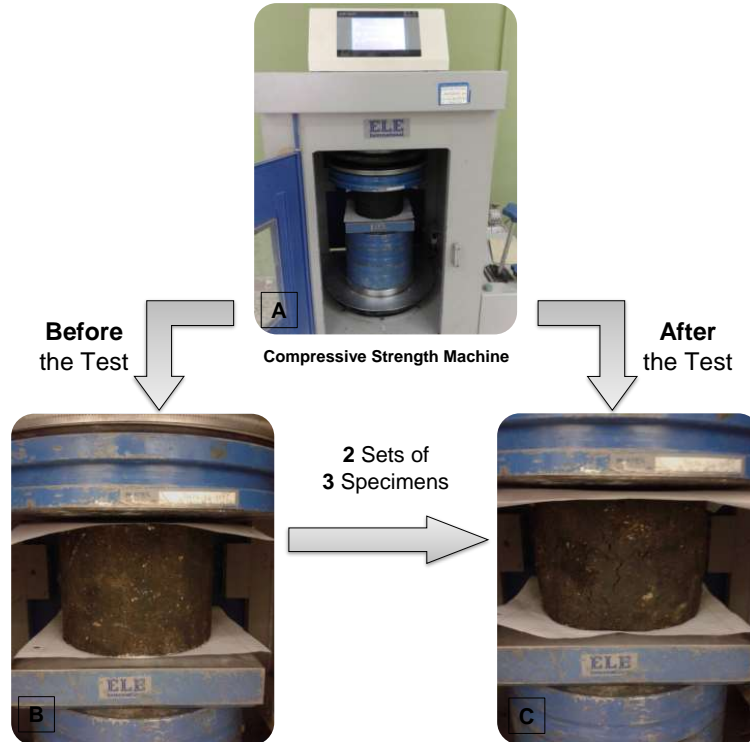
Compressive Strength Machine: (A) View of the Machine, (B) Sample before the Test, (C) Sample after the Test.
